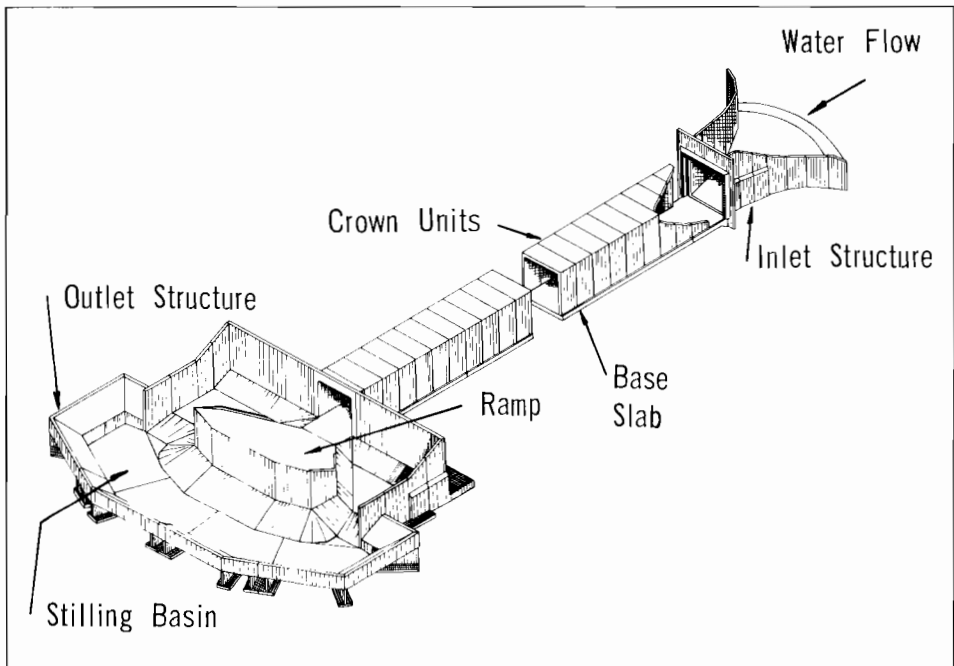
Isometric view of the proposed Cardinia Creek culvert on the Princes Freeway, Berwick Section
